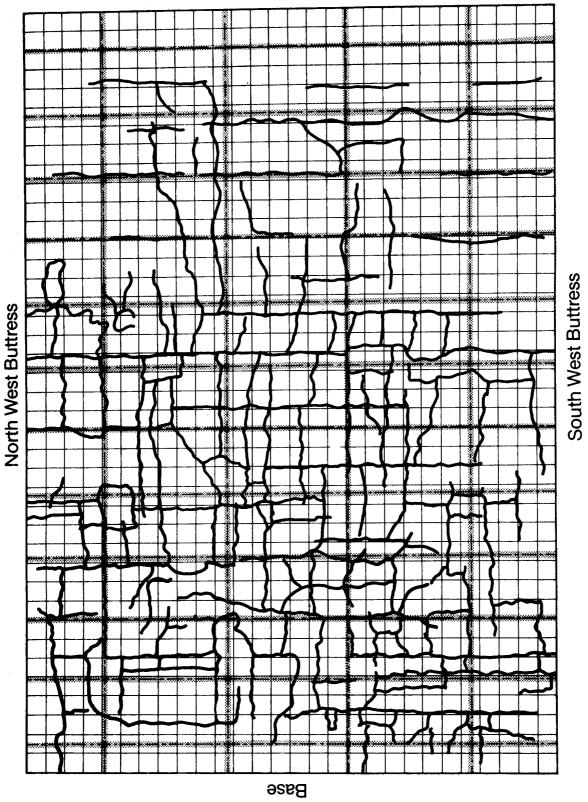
Developed View of West Wall showing Cracks at end of Test F, 80 psi
